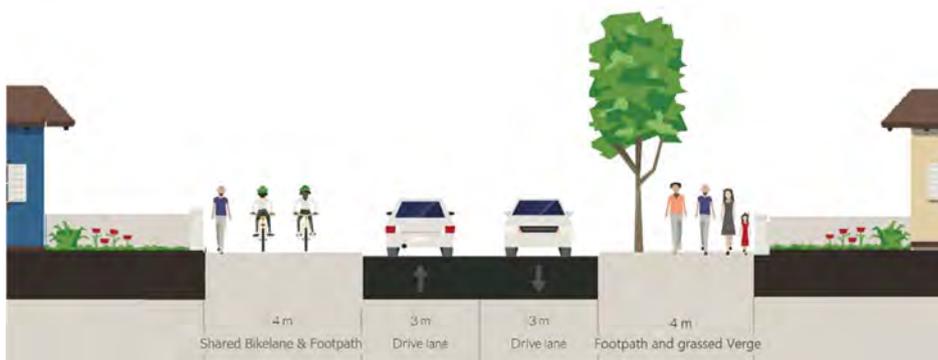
Route 7B, Cross Section A-A Proposed
